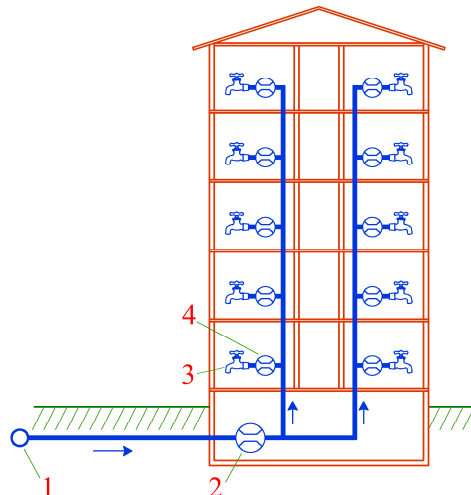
Layout of water meters installed at blockhouses: 1 – water main pipe; 2 – B class bulk water meter; 3 – water user; 4 – C class customer water meter.
